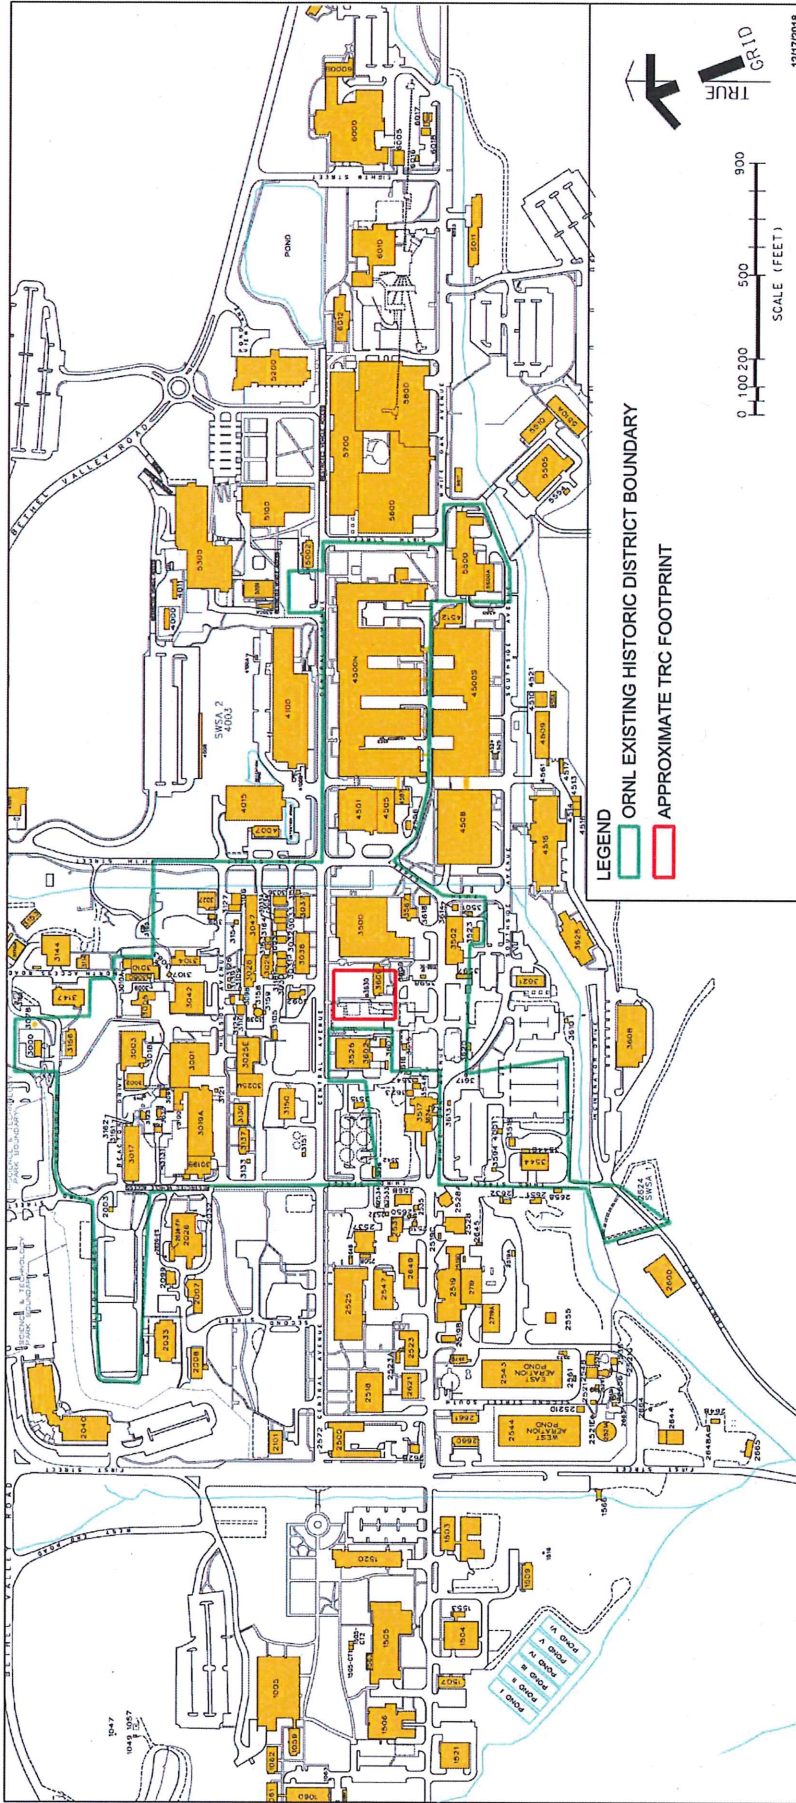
ORNL site plan depicting the proposed TRC location within the ORNL Historic District.
